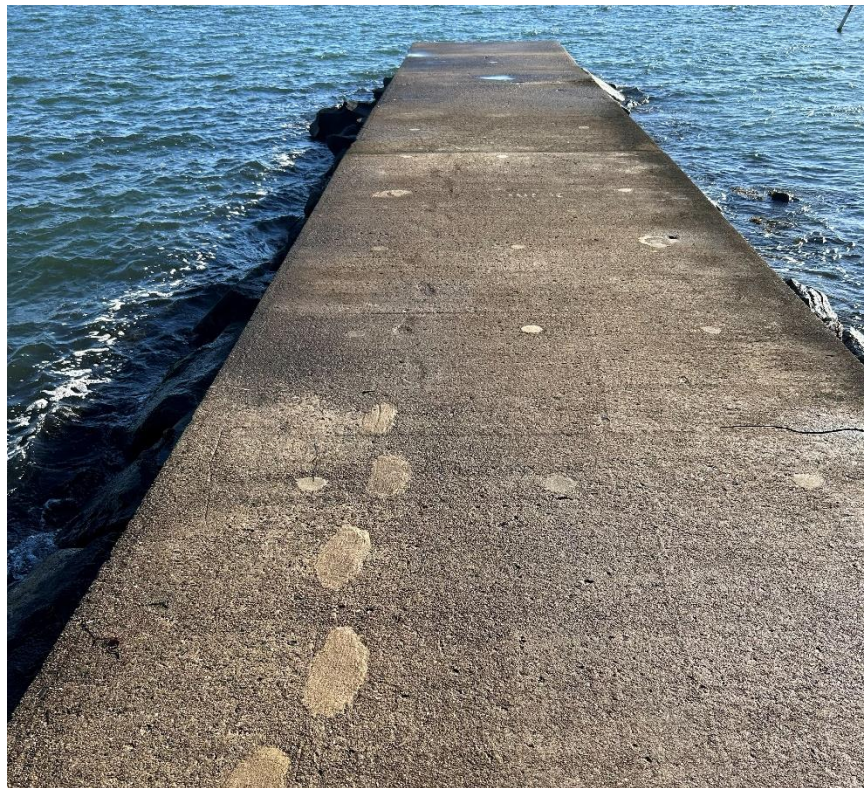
Sea Breeze pier deteriorated concrete end slabs
